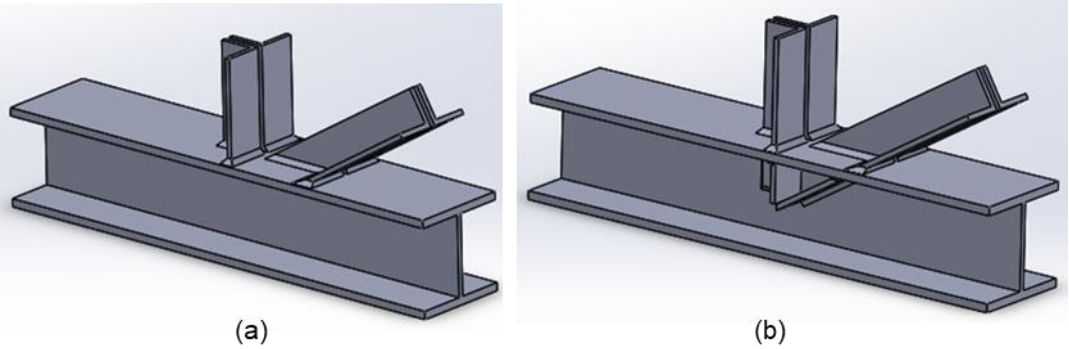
Design model of innovative Open Section N-joints. (a) Traditional joint; (b) New joint.
